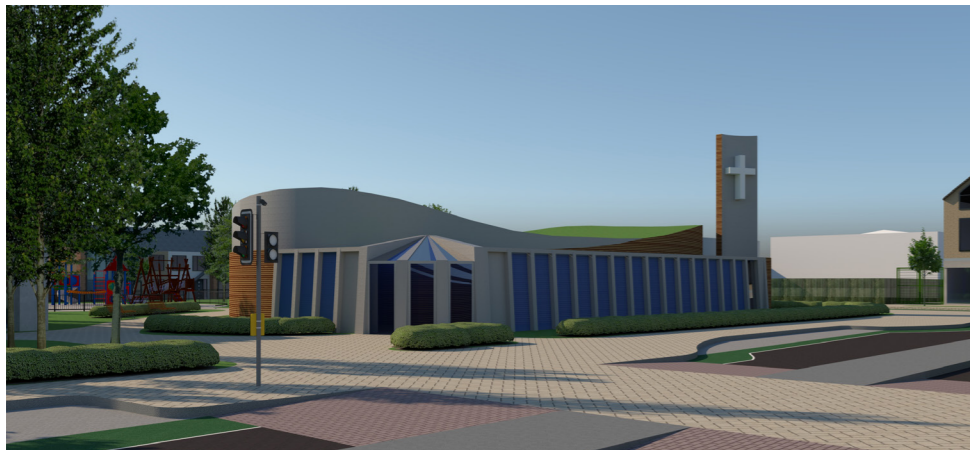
(Above). Refurbished and re-clad church, with new extension, foyer and tower, improving the Blackbird Leys landmark building.
